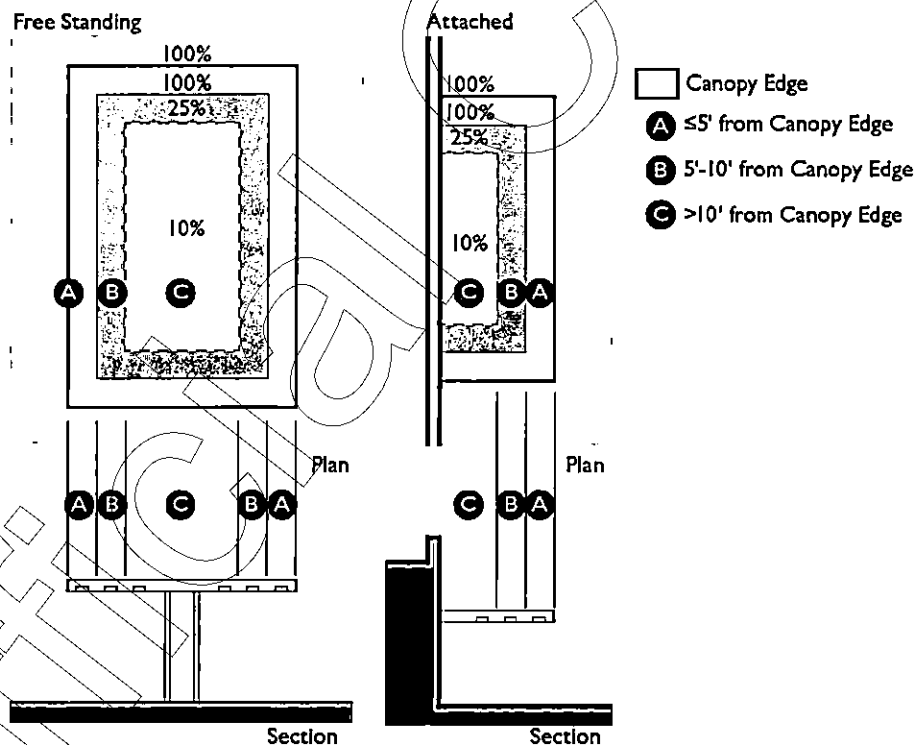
Figure A. Elevation and section views of a freestanding and attached canopy or overhang, showing fixture location and initial lamp output percentage counted toward total outdoor light output
